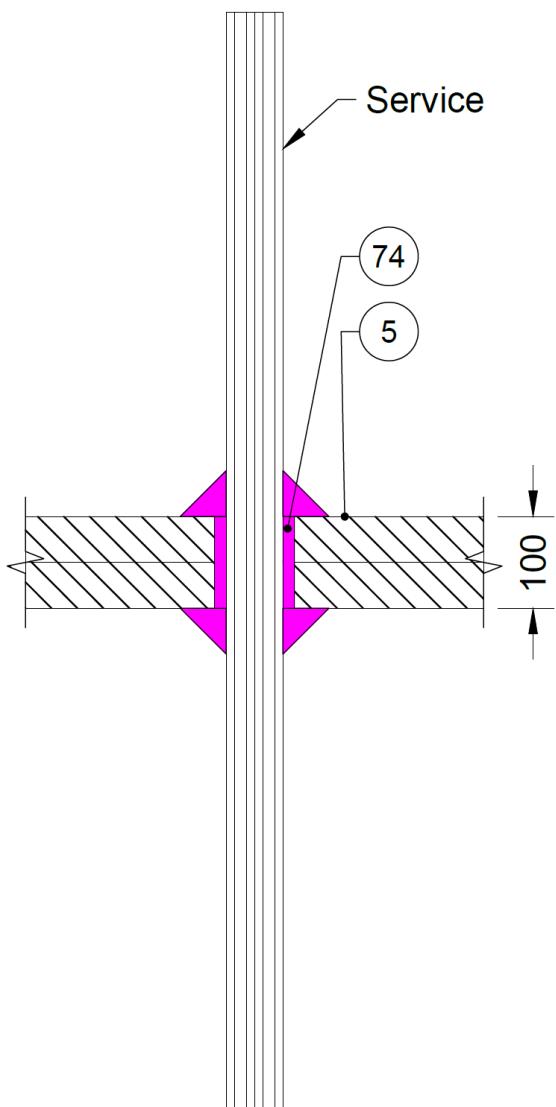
Section View of Pair coil, drain hose and cables Installed in Horizontal Substrates
